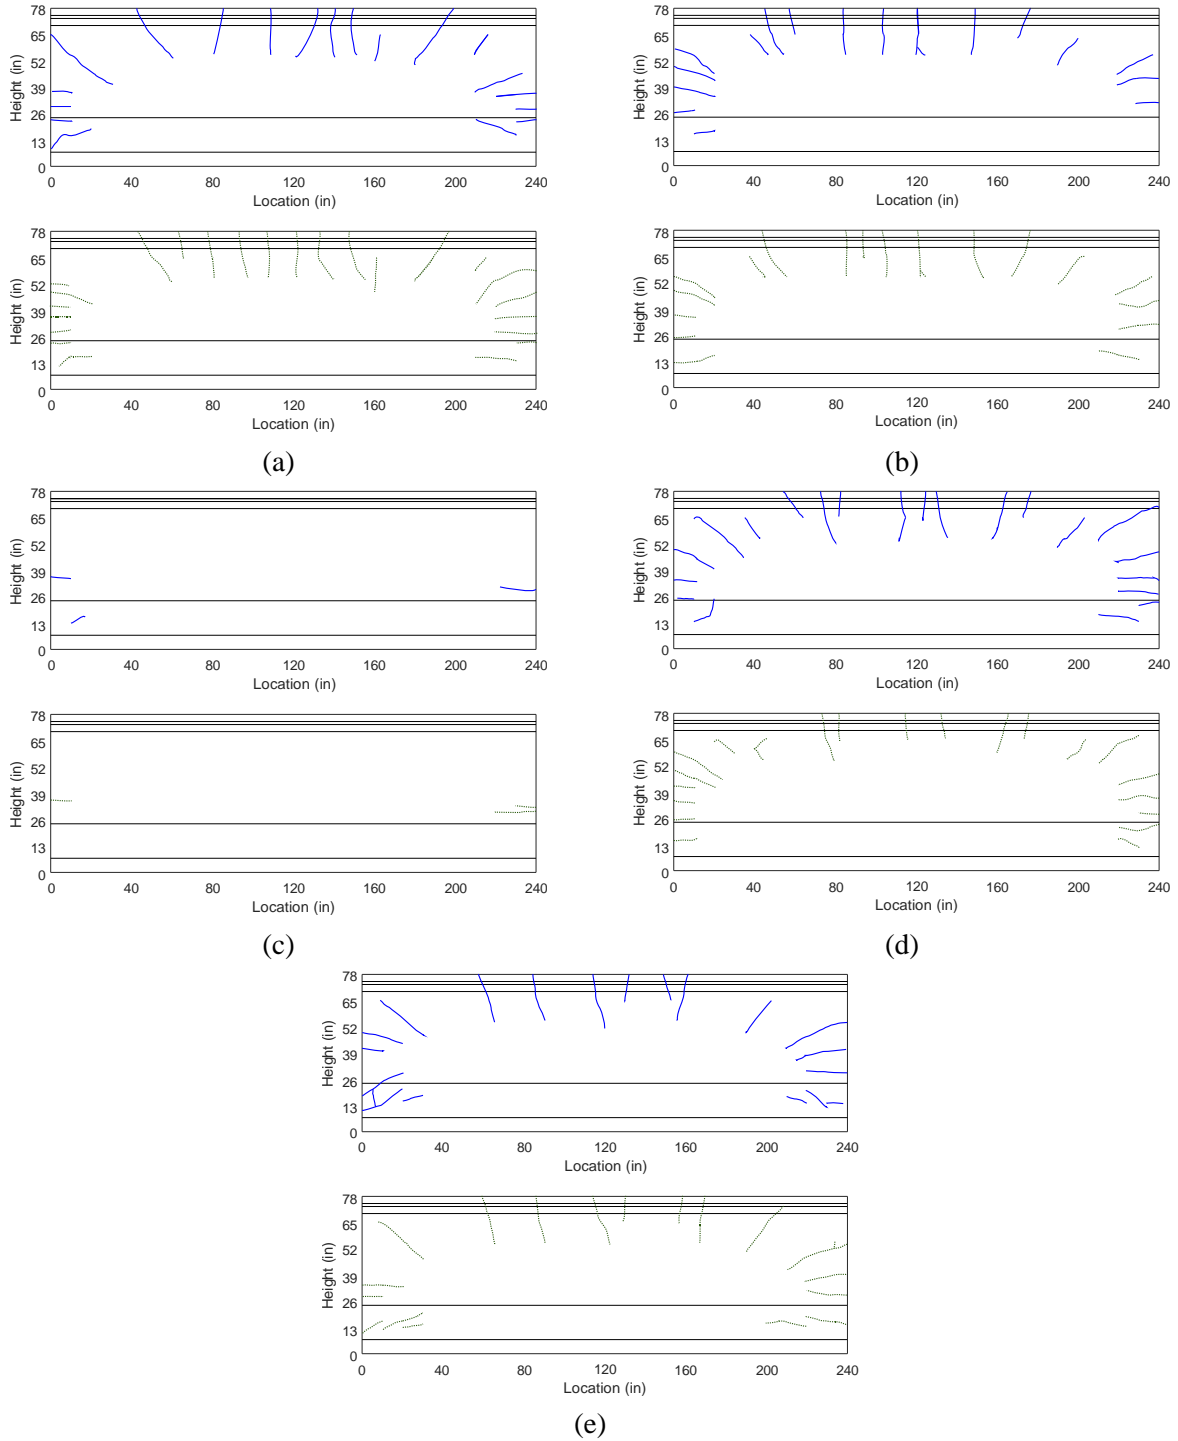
End region cracking at 14 days shown on north elevations of specimen: (a) CT, (b) SH-30, (c) SH-70, (d) CR-70 and (e) PP-50. Solid blue lines depict cracks visible on the North face and dashed green lines depict cracks visible on the South face. Origin at conventional detailing.
